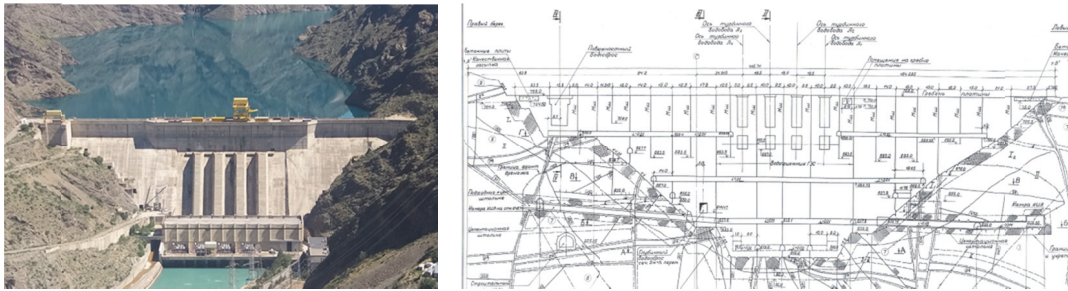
Kurpsai hydropower station and the drawing of the concrete gravity dam (vertical longitudinal section)
